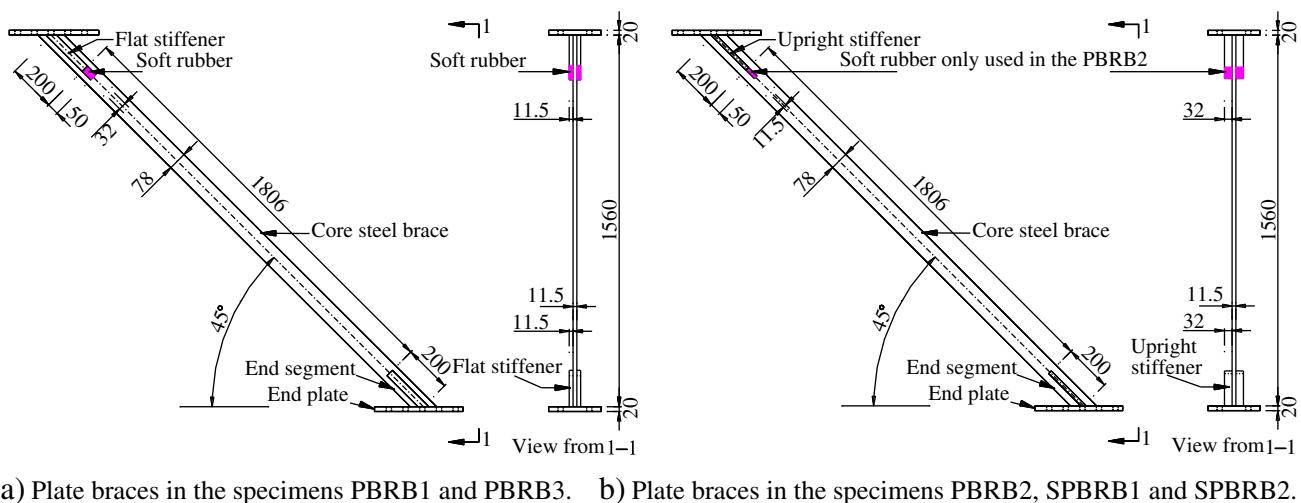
Details of the plate braces for the panel BRB specimens. (a) Plate braces in the specimens PBRB1 and PBRB3. (b) Plate braces in the specimens PBRB2, SPBRB1 and SPBRB2.
